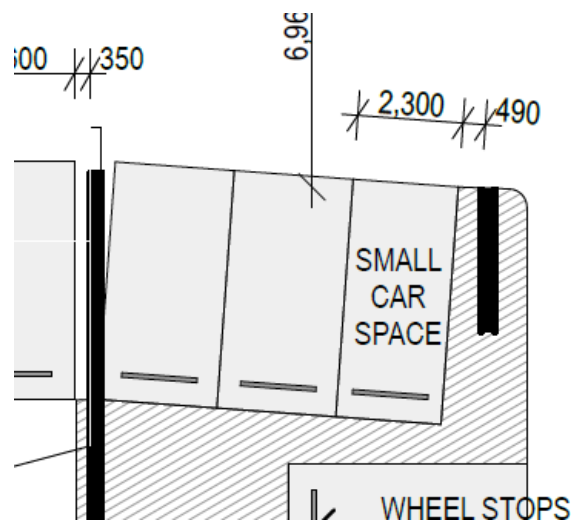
anomaly carparking spaces on Lower ground floor plan
